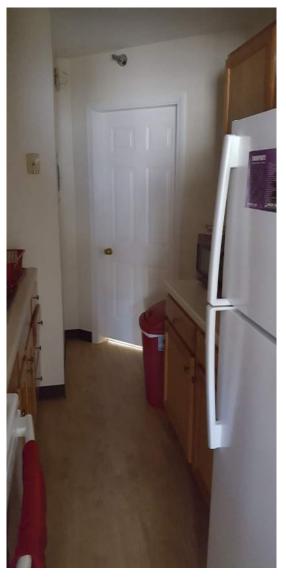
TYPICAL VIEW FROM INSIDE APARTMENT OF SPRINKLER COVERAGE ENDING AT ENTRY DOOR.
